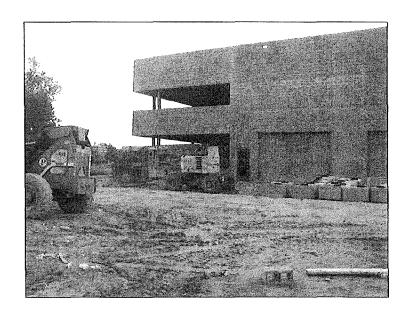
Northeast Building Façade Slated for Barrier-Free Parking Spaces
